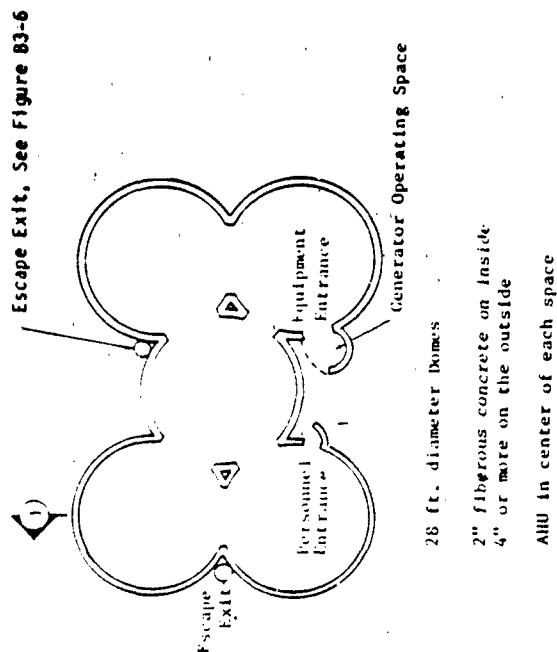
DOME CONSTRUCTION--FLOOR PLAN.
